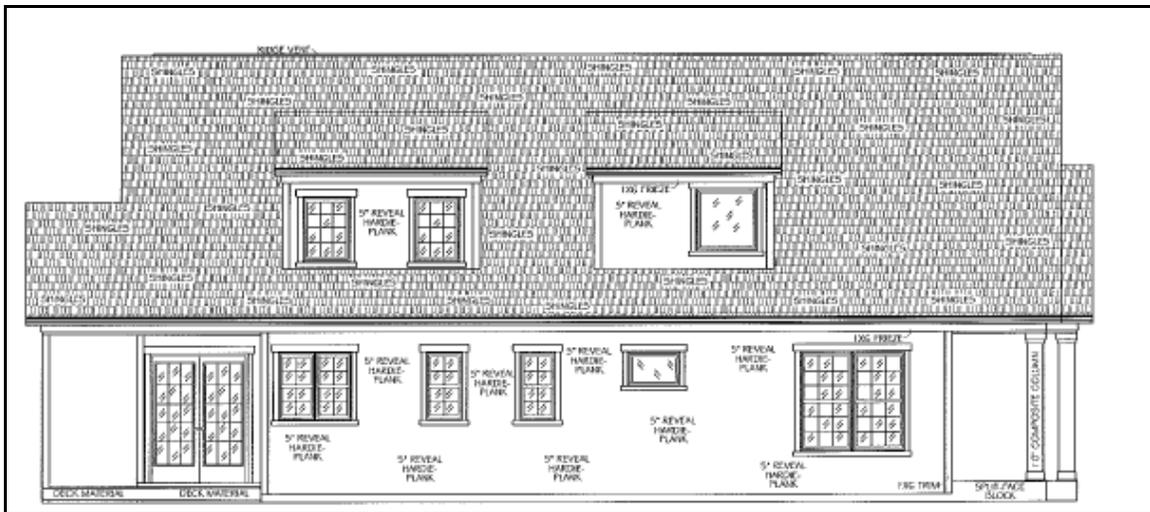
Proposed left elevation, note lack of glazing in dormer on the right
